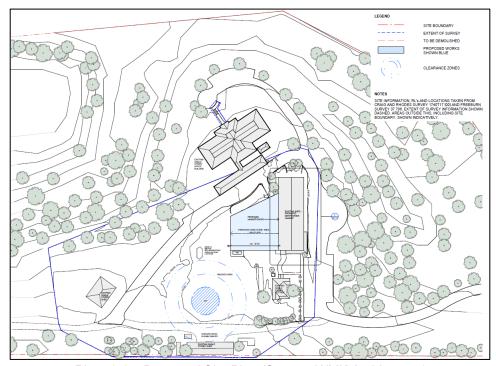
Proposed Site Plan (Source: WMK Architecture)
